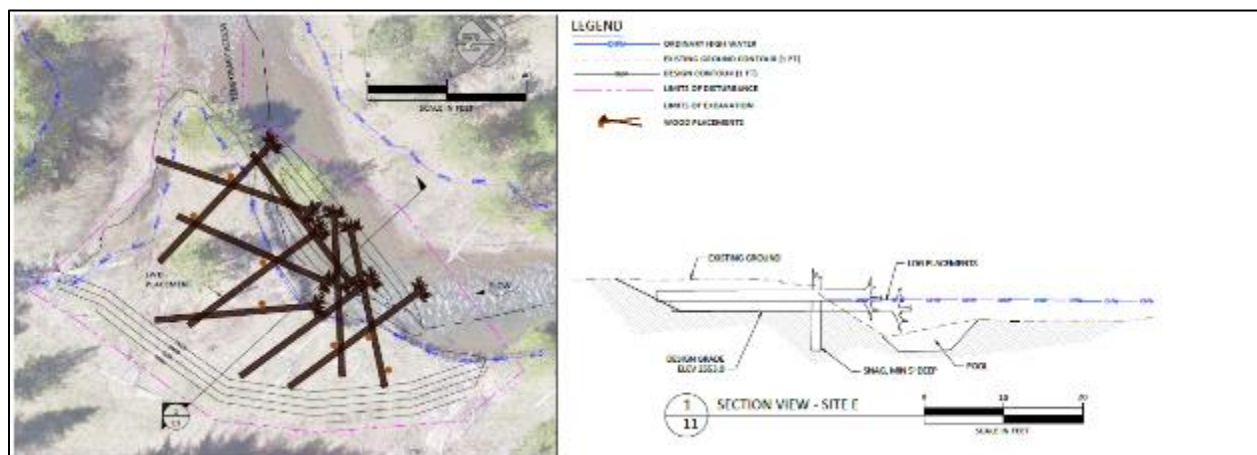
Plan view of Site E depicting log configuration, excavated pool and floodplain terrace.
